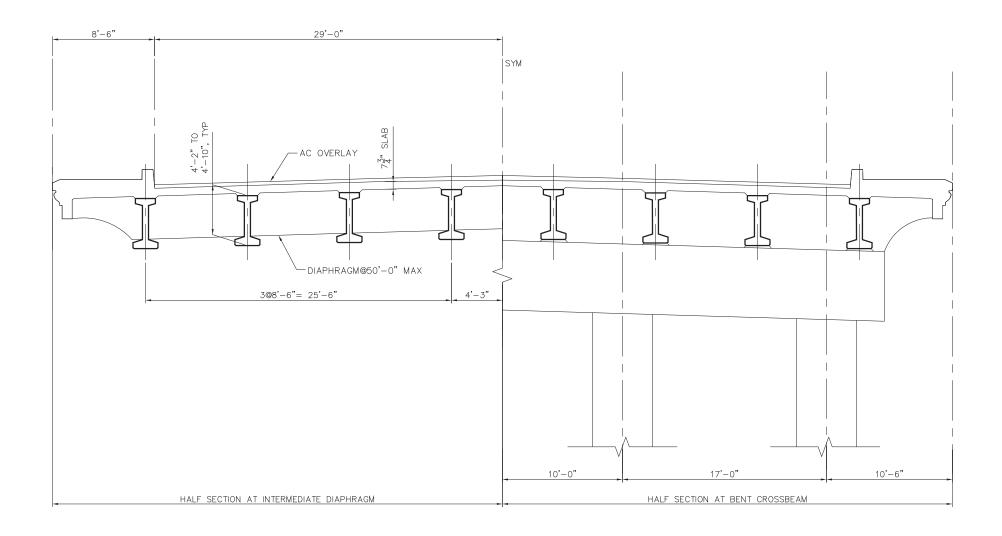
PRECAST CONCRETE I-GIRDER DECK SECTION
